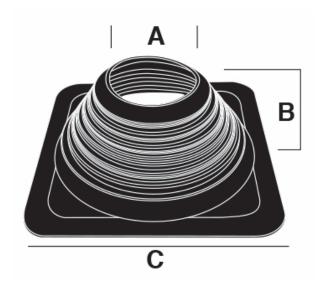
SQUARE MASTER FLASH ROOF FLASHING TYPICAL PROFILE
